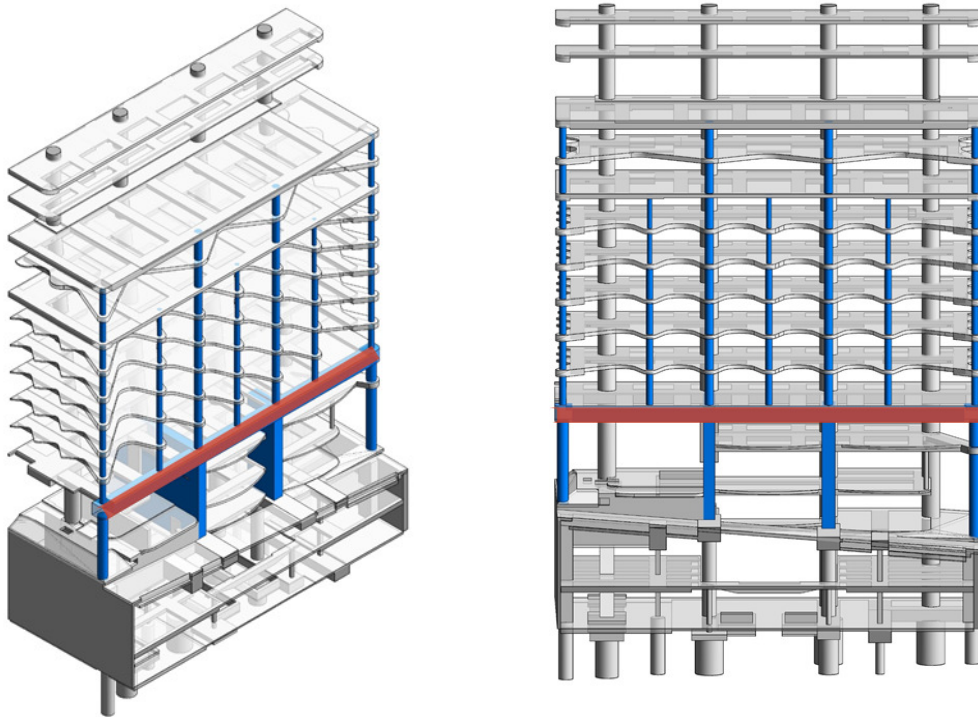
South Tower north elevation structure. The transfer beam is shown in red.
